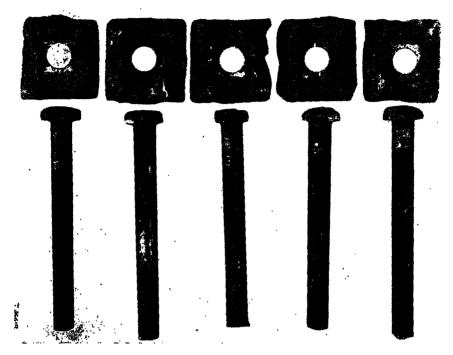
Through Bolts, Condition of Bolts and Headlock Washers Removed in 1947, After 18 Years' Service.
